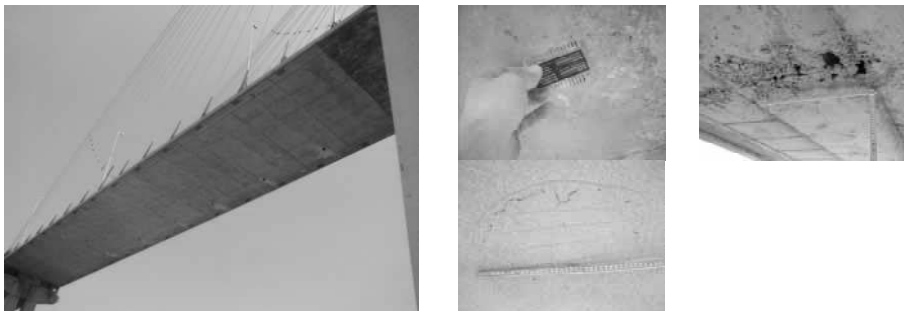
Deck slab of central bridge, very small cracks of ~0.10 mm width at the bottom surface of the slab, locally large porous and delamination at the bottom surface of the slab
